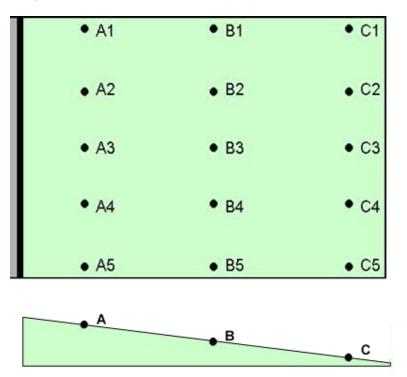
FS with Uniform Slope (Plan and Profile Views)
